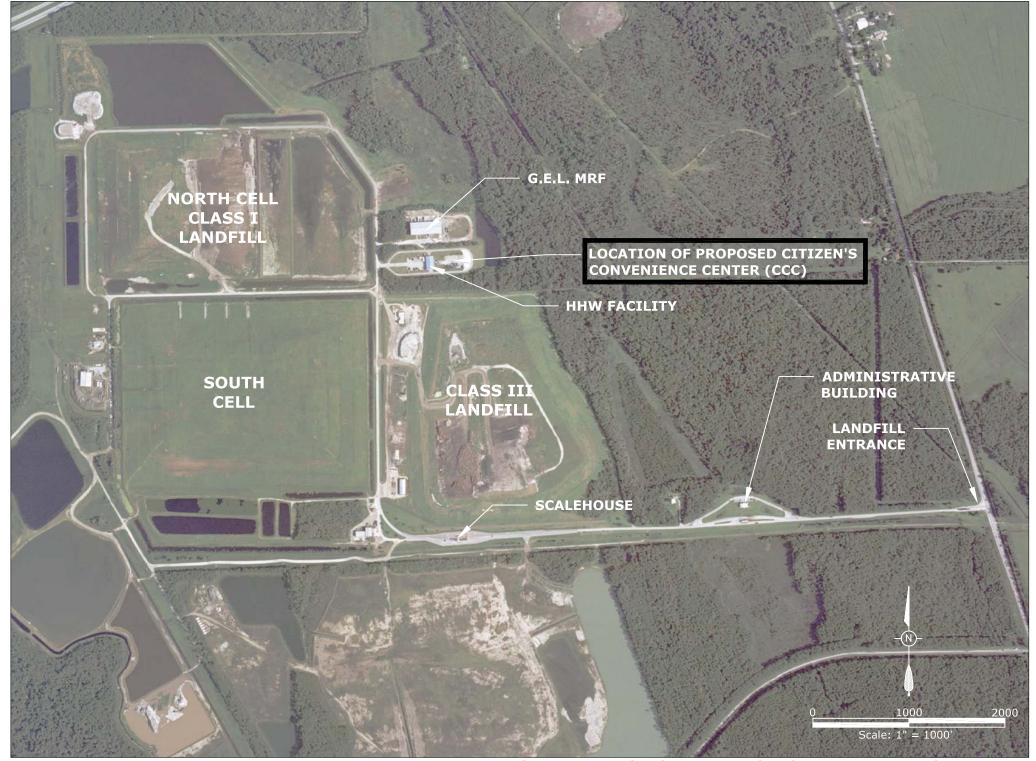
TOMOKA FARMS ROAD LANDFILL SITE PLAN
